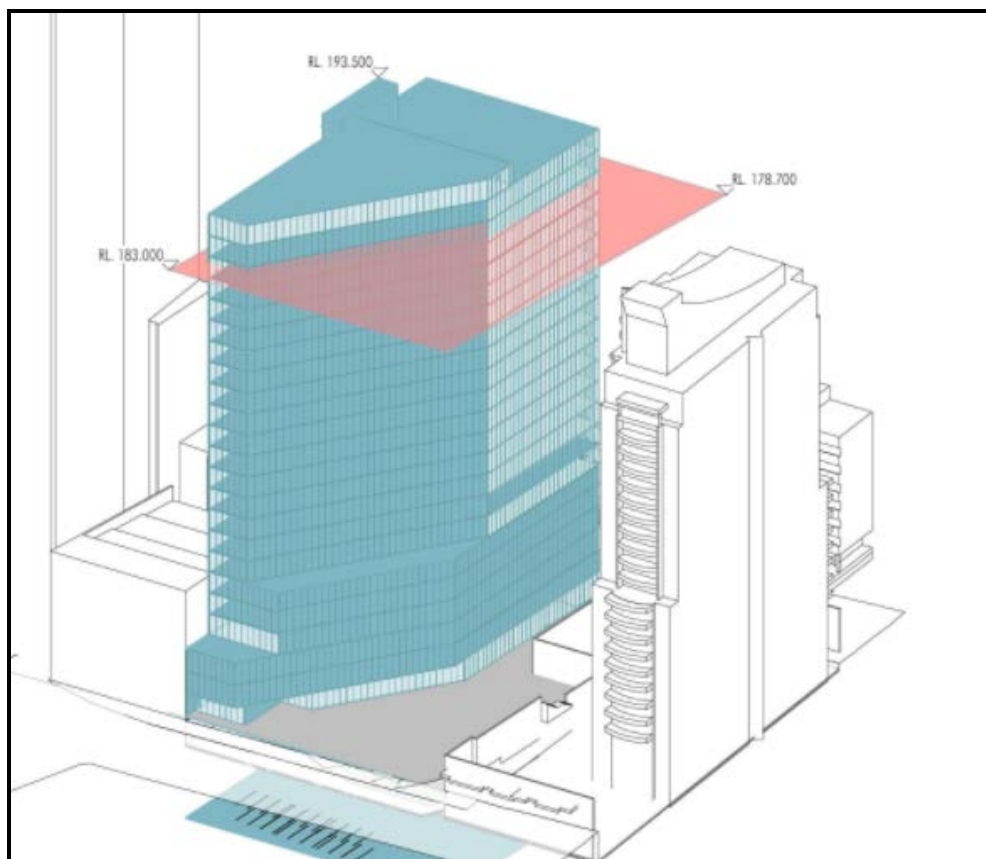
Proposed building envelope viewed from north (extract from architectural plans)
